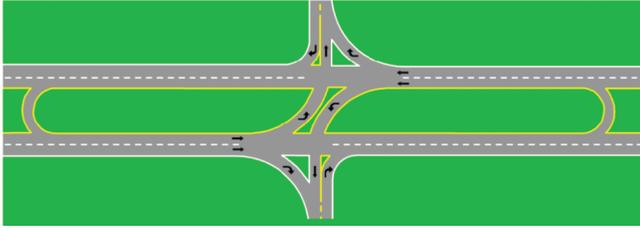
Plan view of a J-turn intersection, similar to the one constructed in Maryland (18).
